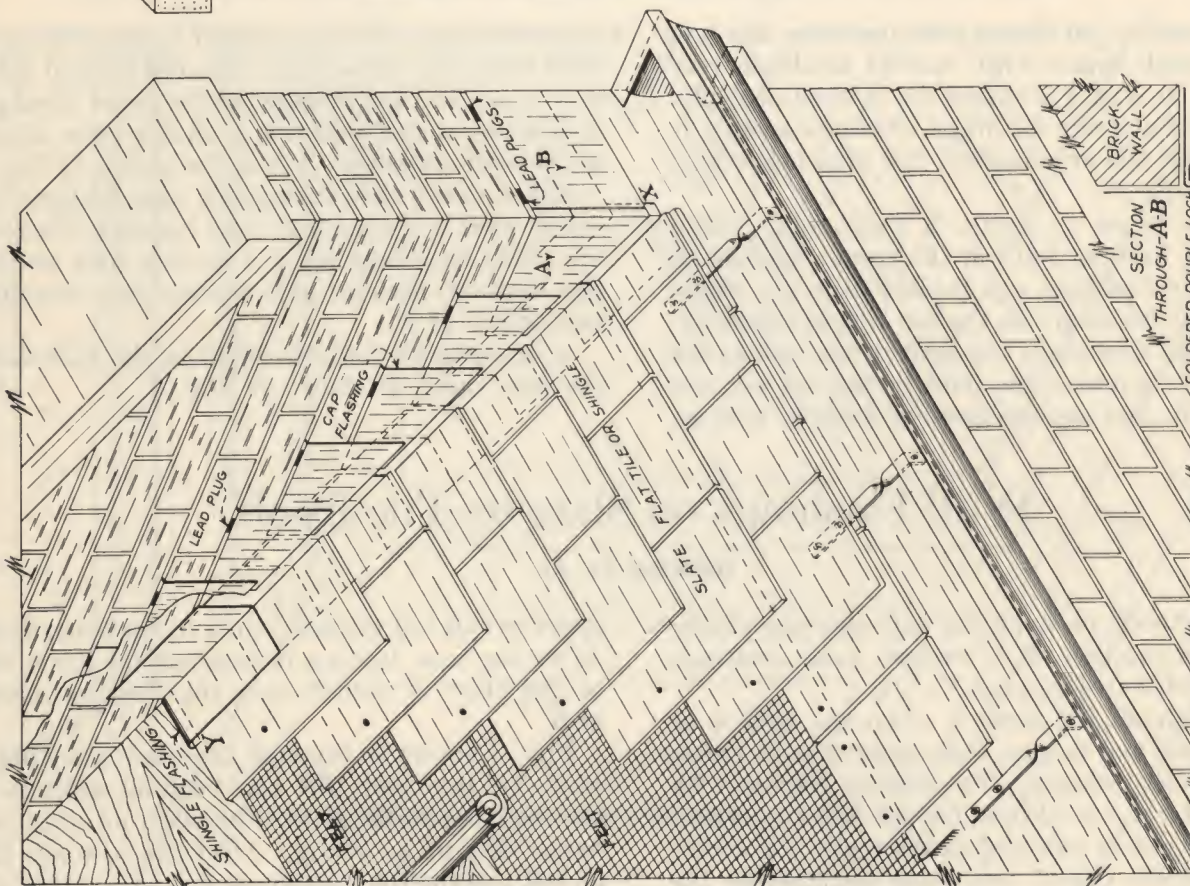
METHOD OF APPLYING SHINGLE AND CAP FLASHINGS AGAINST GABLE WALL WHEN ROOF IS COVERED WITH EITHER SLATE, FLAT TILE OR SHINGLE
